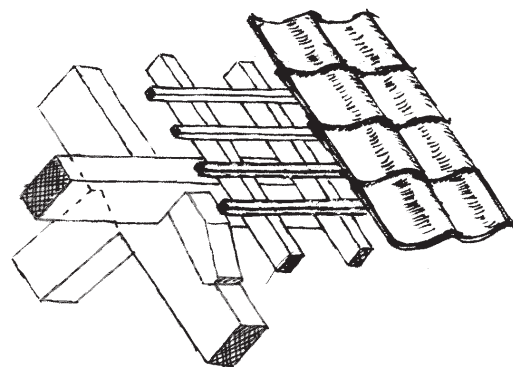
Roof construction (Gmelig Meijling, 1953, P.31)
